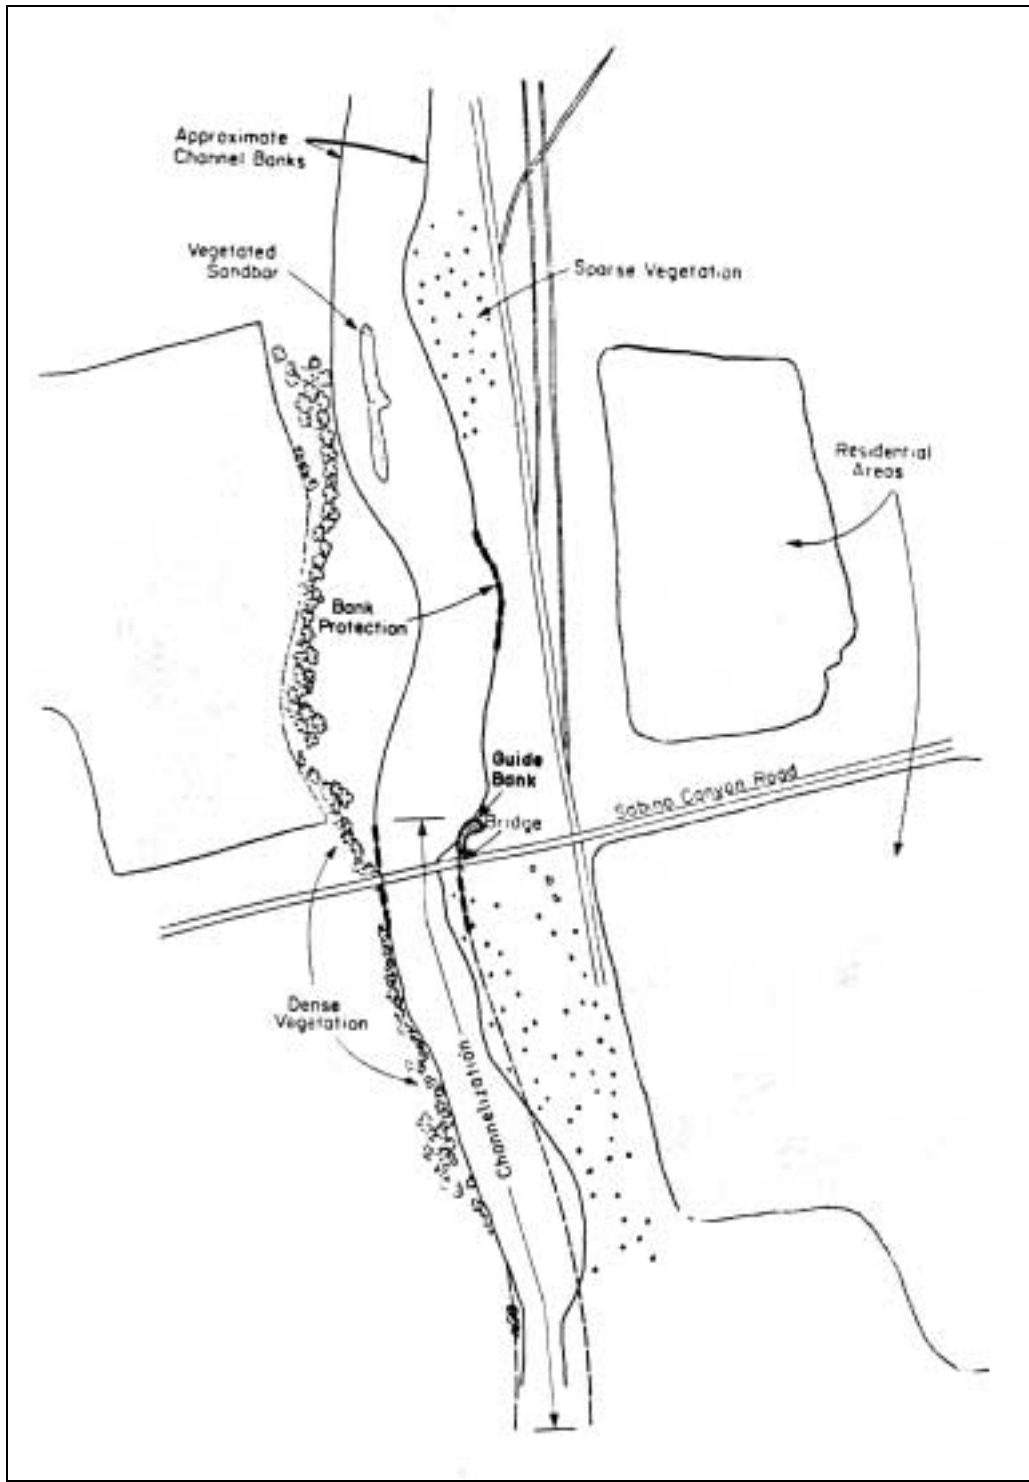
General plan view of Sabino Canyon Road crossing for alternative II, III, and IV (II Shown).
